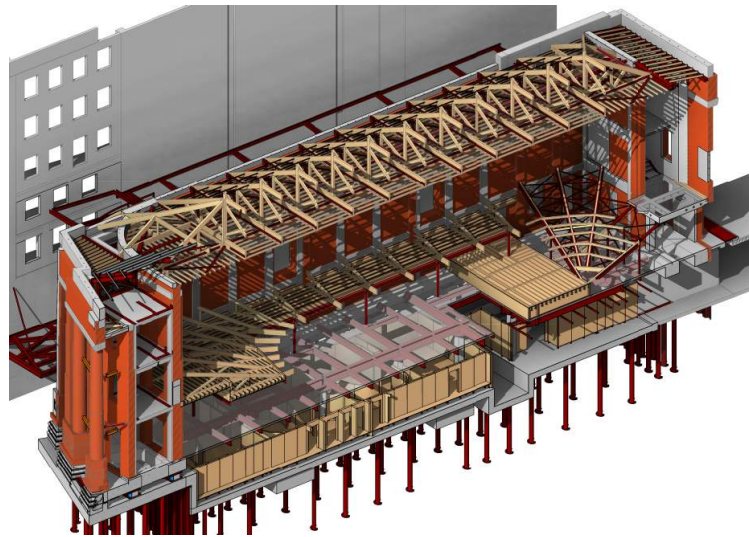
Section through the auditorium illustrating the layout of the roof trusses and tiered choir stalls
